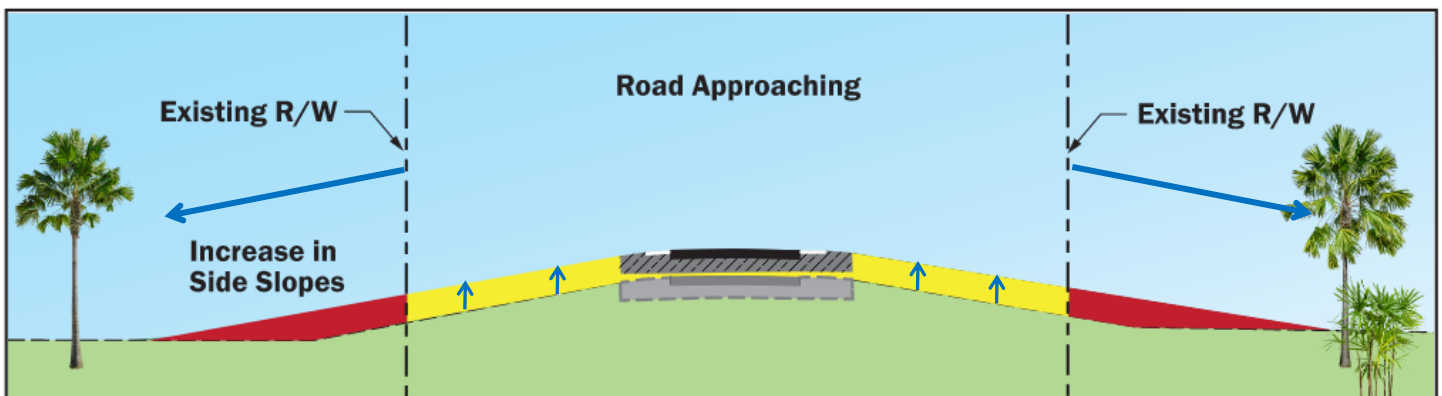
Cross section showing the change in the footprint of the road as the grade is raised.
